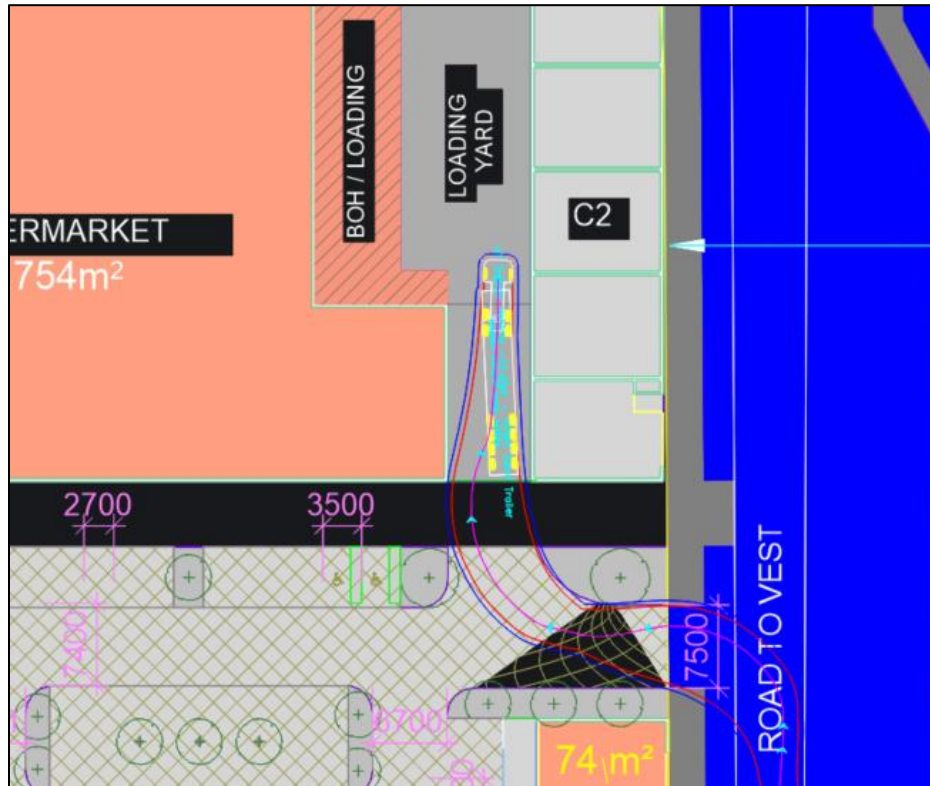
Super lot VC1 – loading space tracking (ground floor)
